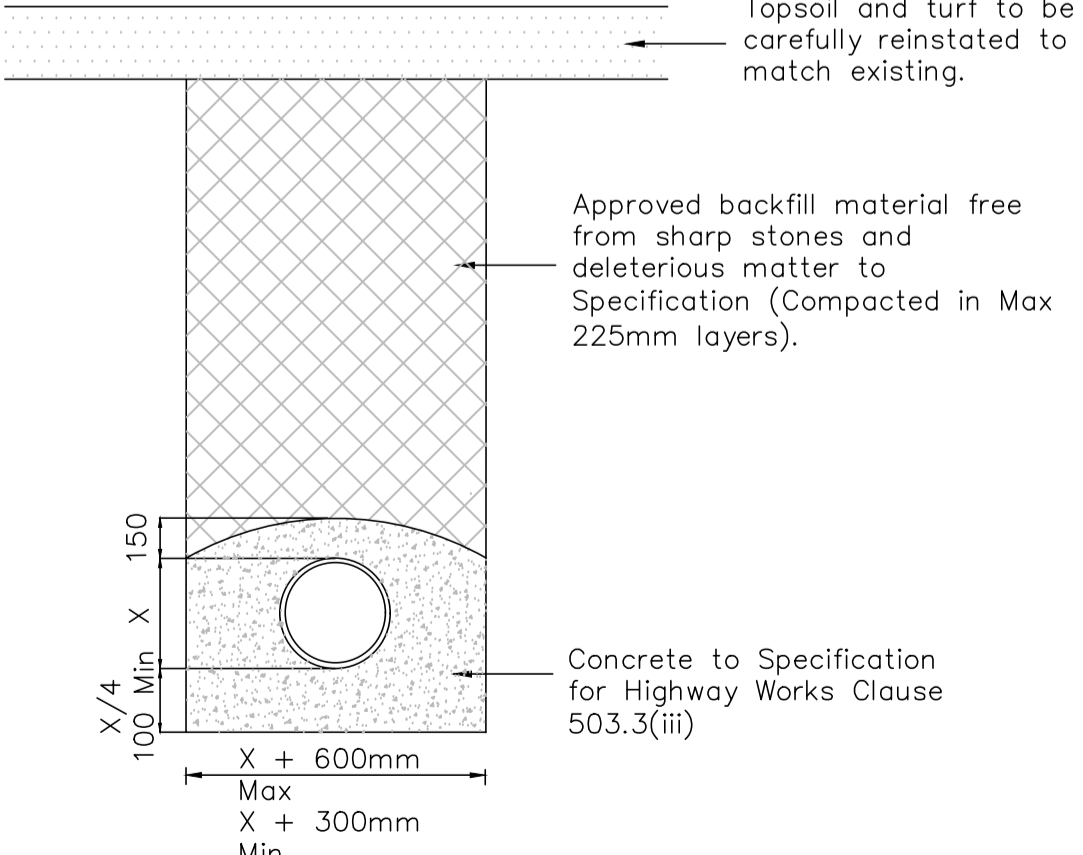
DETAILS OF PIPE CONSTRUCTION UNDER ROADS AND FOOTPATHS (COVER > 1.2m TO CROWN)
